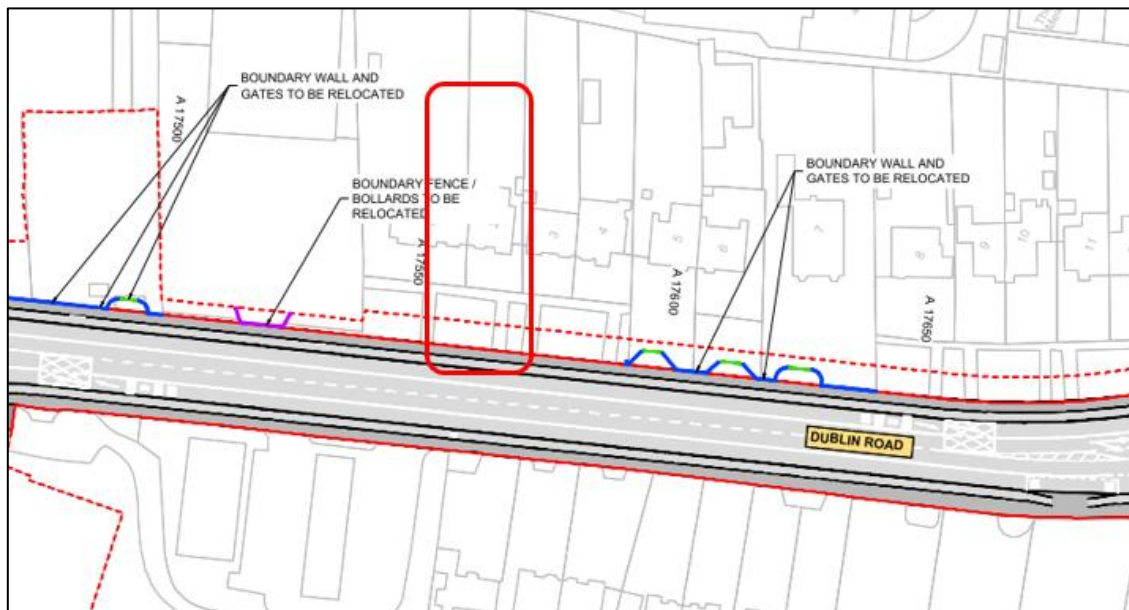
Extract from Fencing and Boundary Treatment Drawing at Dublin Road (Sheet 50)
